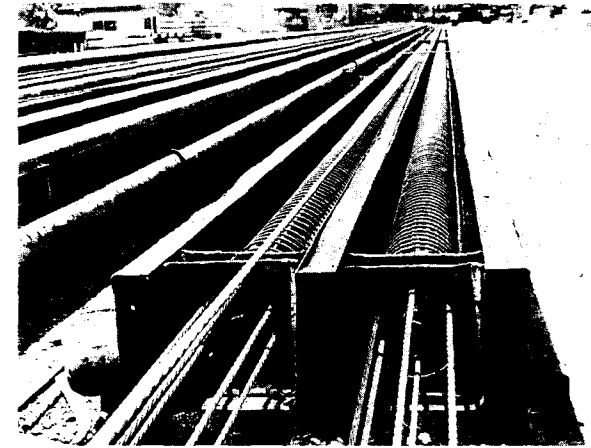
These steel forms are used to manufacture prestressed concrete piles. The prestressing cables, visible in the foreground, are in place and have been subjected to a tensile force. The spiral reinforcement also is in place. The next step will be to fill the forms with high quality concrete, cover them with a tarp, and steam-cure them overnight. The next day, the tension on the cables will be released, then the piles will be removed from the forms and allowed to cure.
